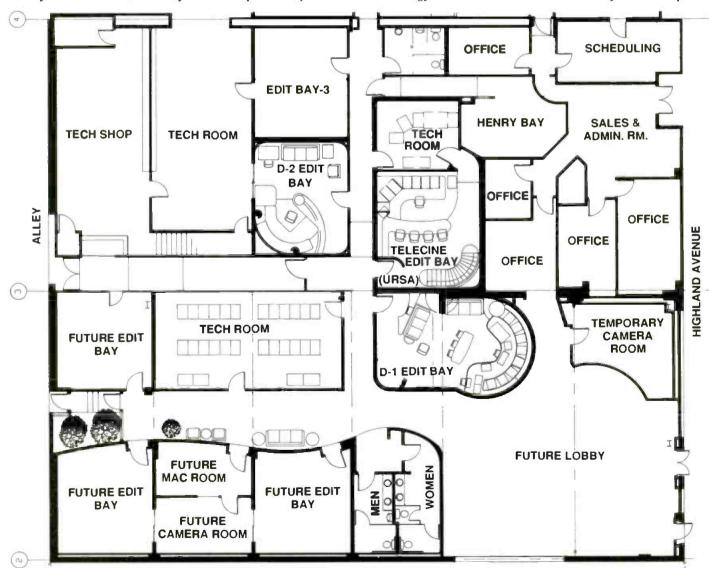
Floor plan for Editel LA. Drawing courtesy of Gary Heathcote, AIA.
